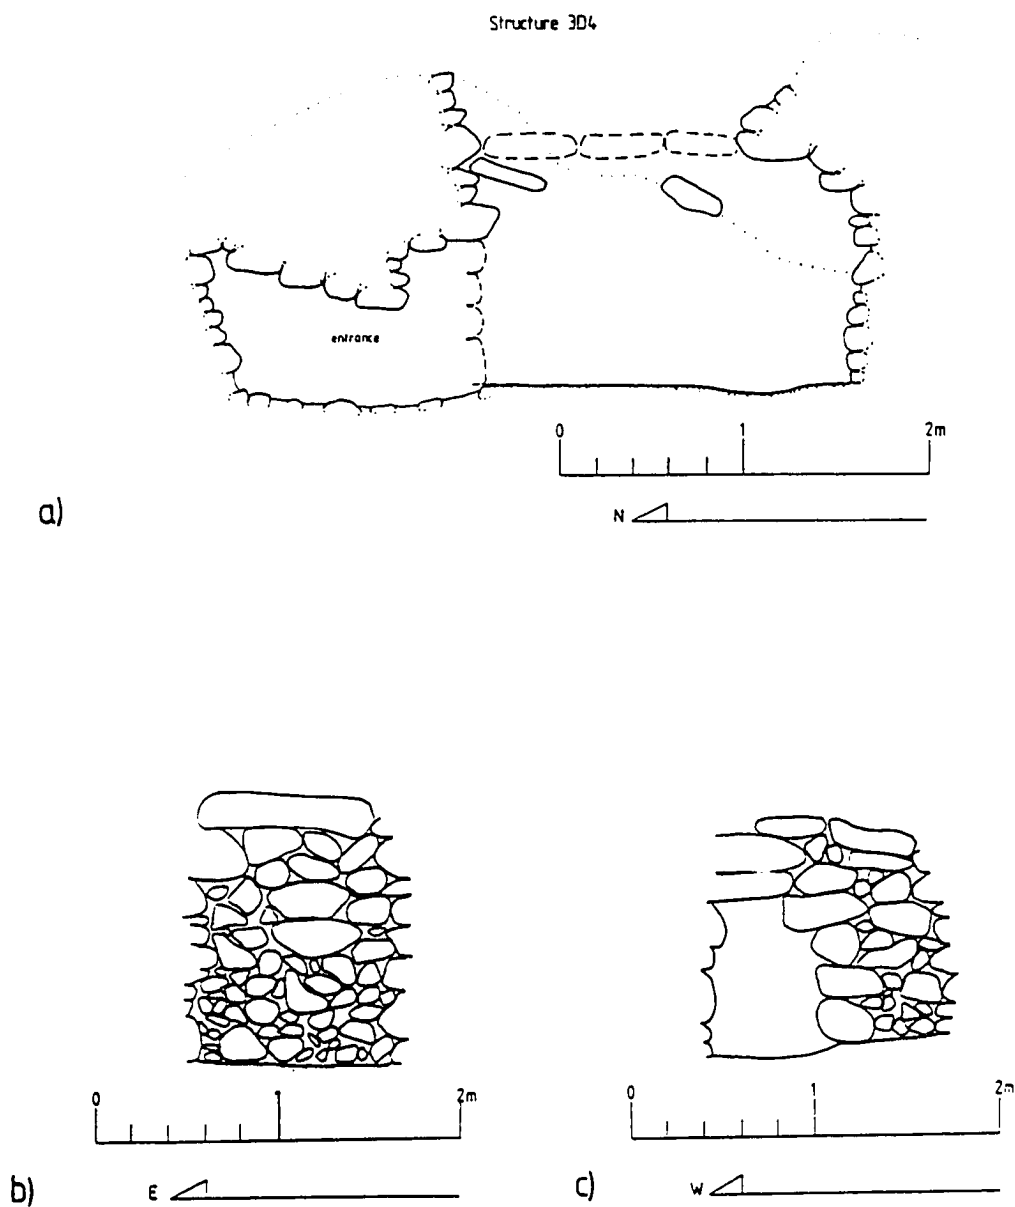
Structure 3D4 Special Deposit C54A-1 a) north-south section, b) elevation of the south wall, c) elevation of the north wall and entrance.
